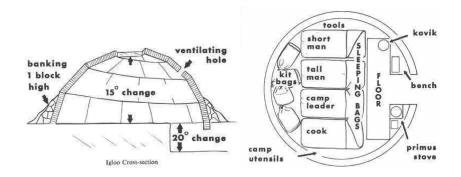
Igloo cross section & plan (Roaf, 2001)
